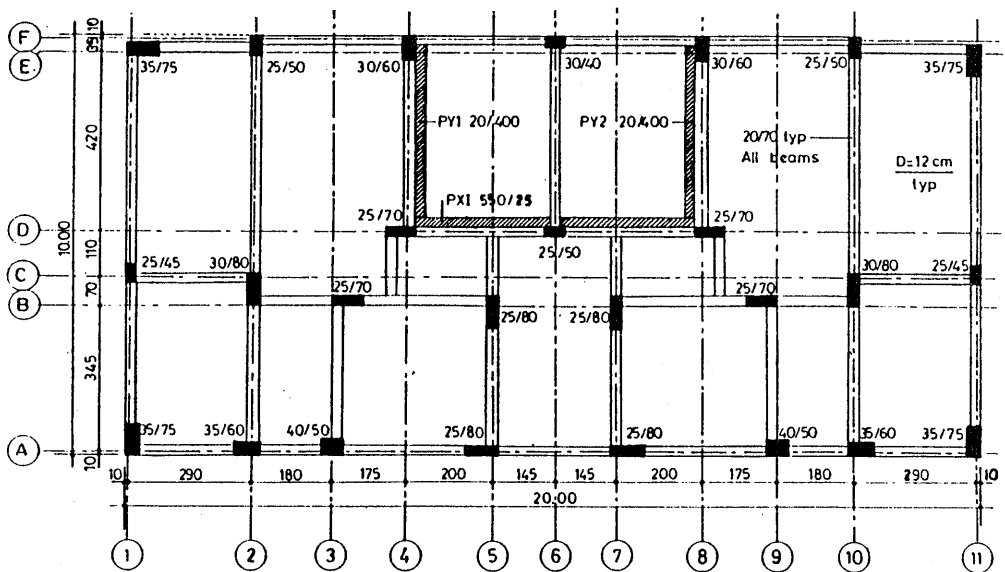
FLOOR PLAN - YAYLA APARTMENTS
